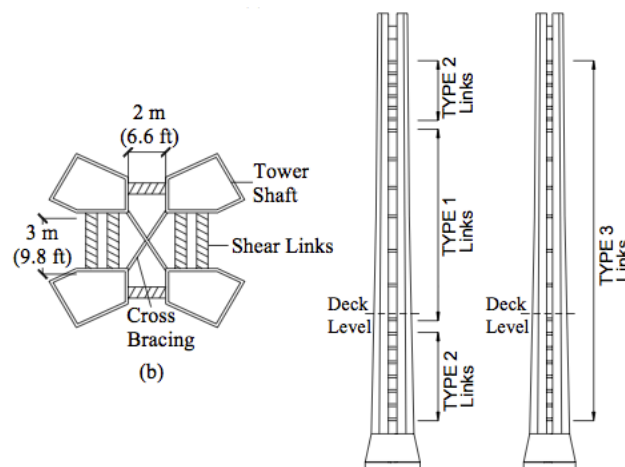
Cross section, transverse and longitudinal tower elevation, respectively [14].
